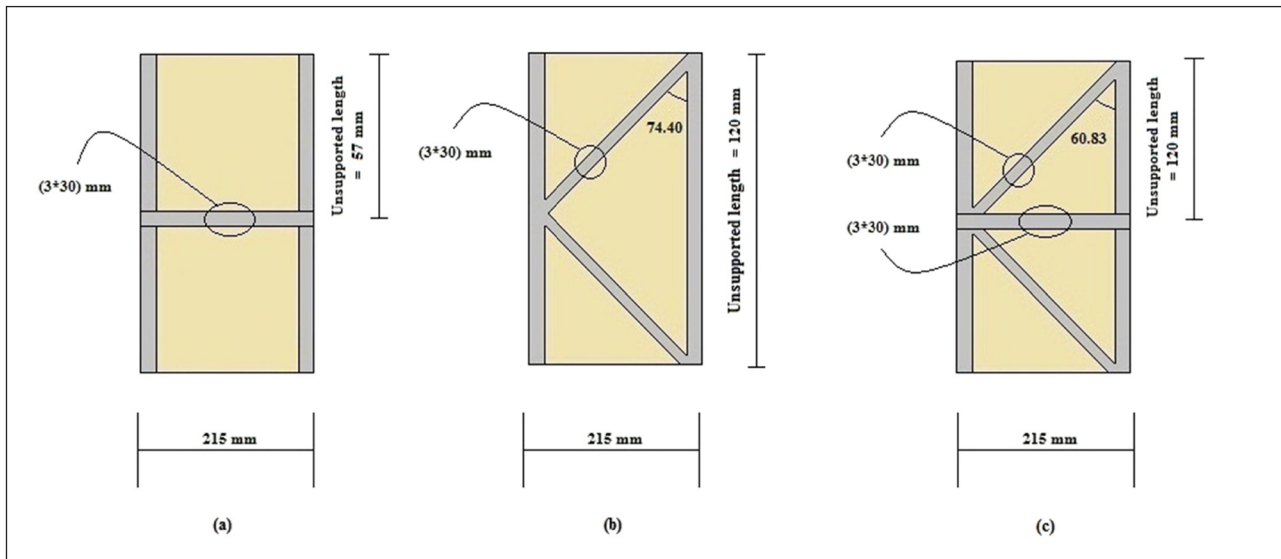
Details of battens and lacings for different case patterns of steel jacket. (a) Battens, (b) single lacing, and (c) lacing and battens.
